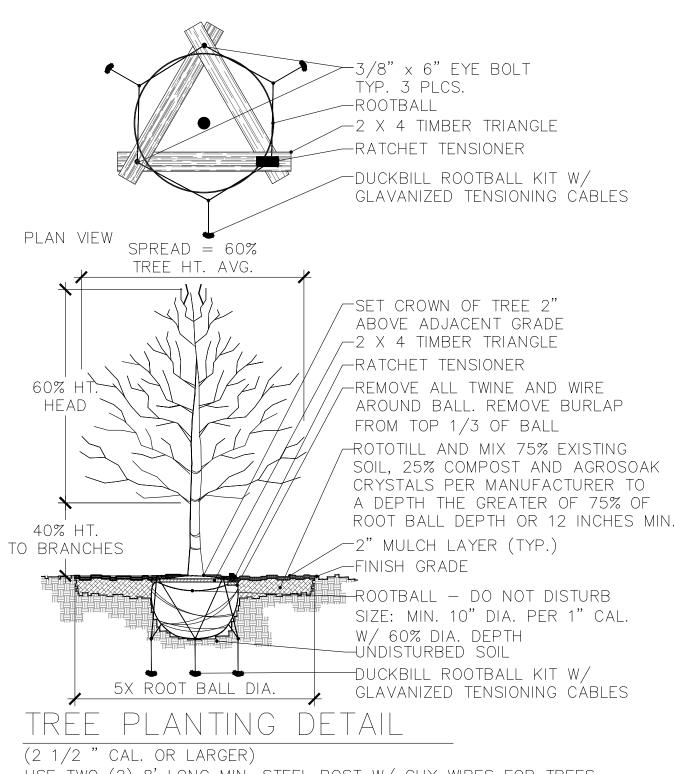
ANDSCAPE NOTES, DETAILS-LS2
